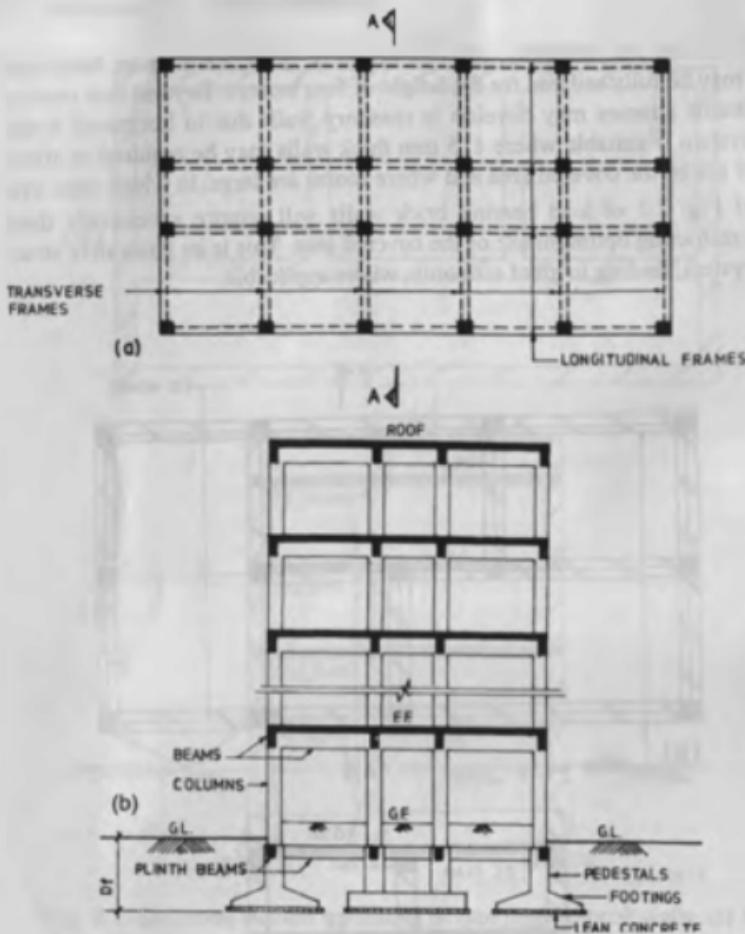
Structural system of RC frames. (a) Plan of building; (b) Section A-A.
